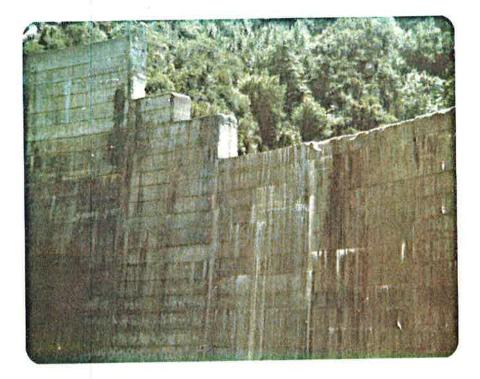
Left side of arch. Note cracking at lift lines.
